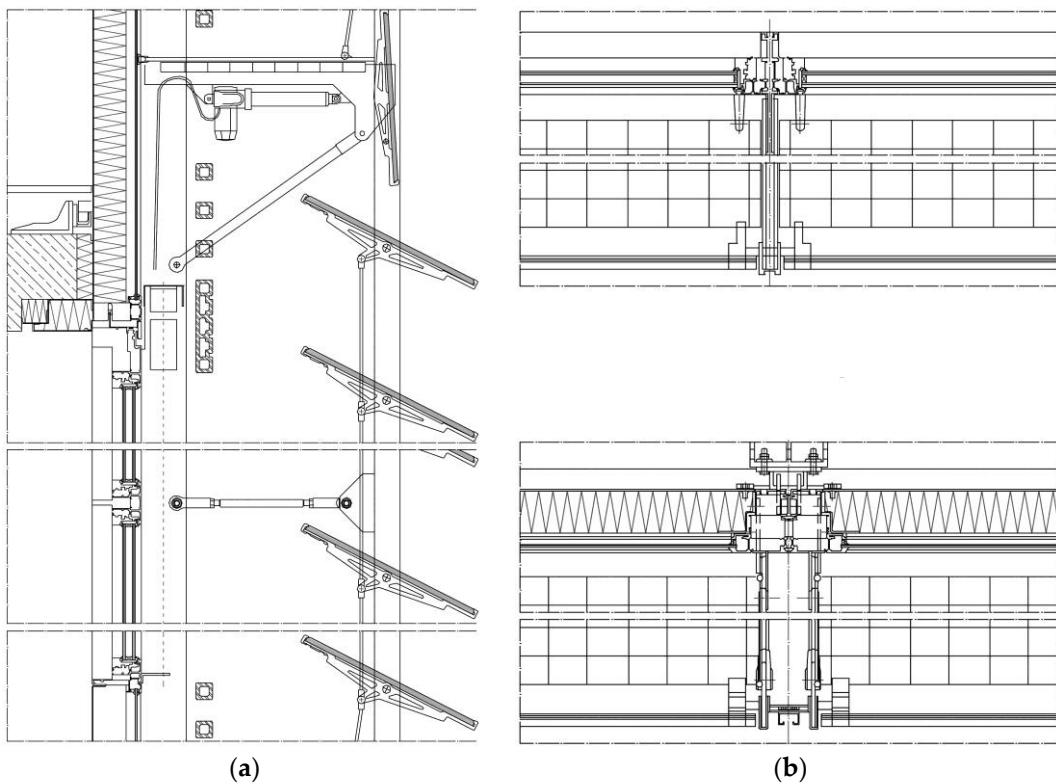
Sustainable methods of the multistory systems (Renzo Piano Building Workshop, Debis-C1 Building, Potsdamer Platz sector, Berlin): (a) The internal panels constitute the curtain wall and window frames with the double-glazing (thickness = 38 mm, gas-filled in the cavity, thermal transmittance coefficient $U_w = 1,1 \text{ W/m}^2\text{k}$); (b) The cavity includes the walkable grid.
